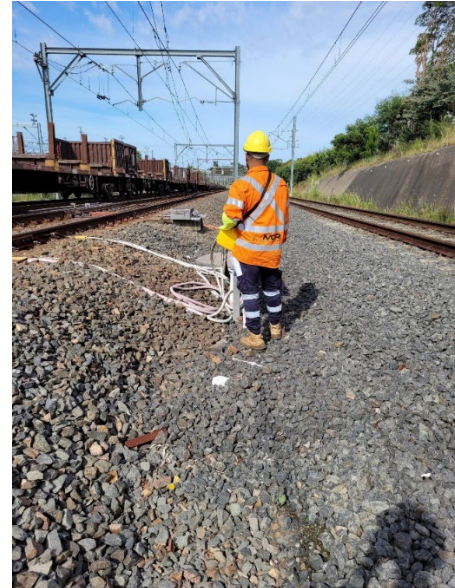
Lookout in 6-Foot between Down Main and Down Relief looking for approaching rail traffic from the Down direction
